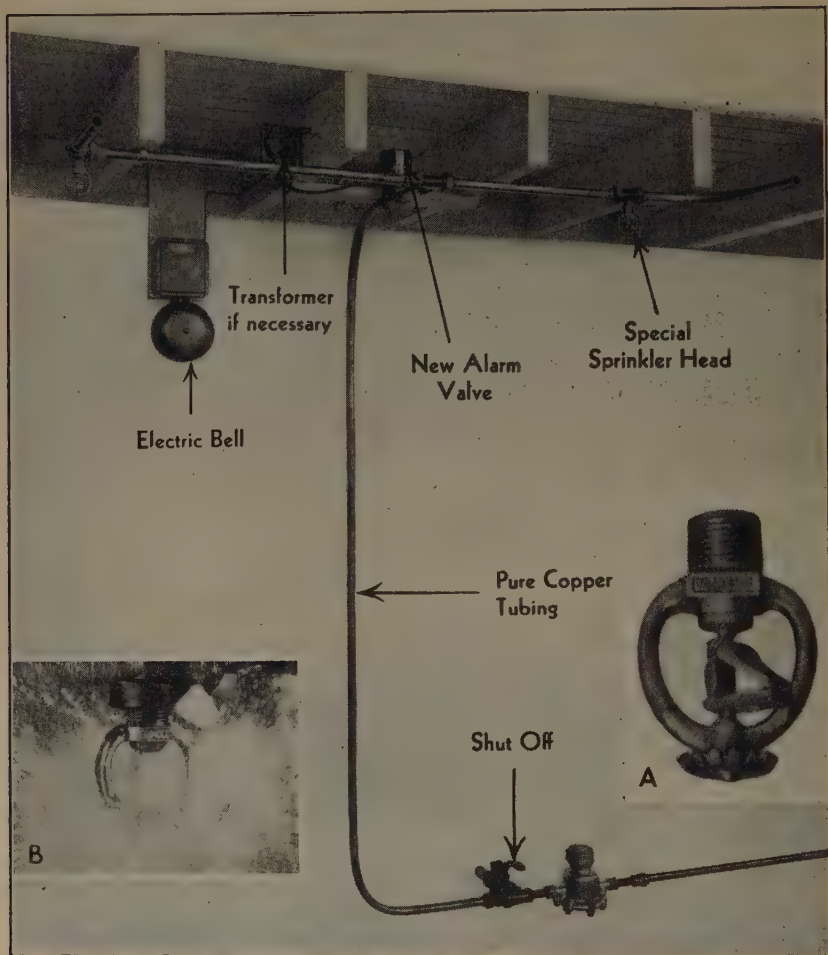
Installation of sprinkler system. Inserts: A. Sprinkler head. B. Sprinkler head in action.
